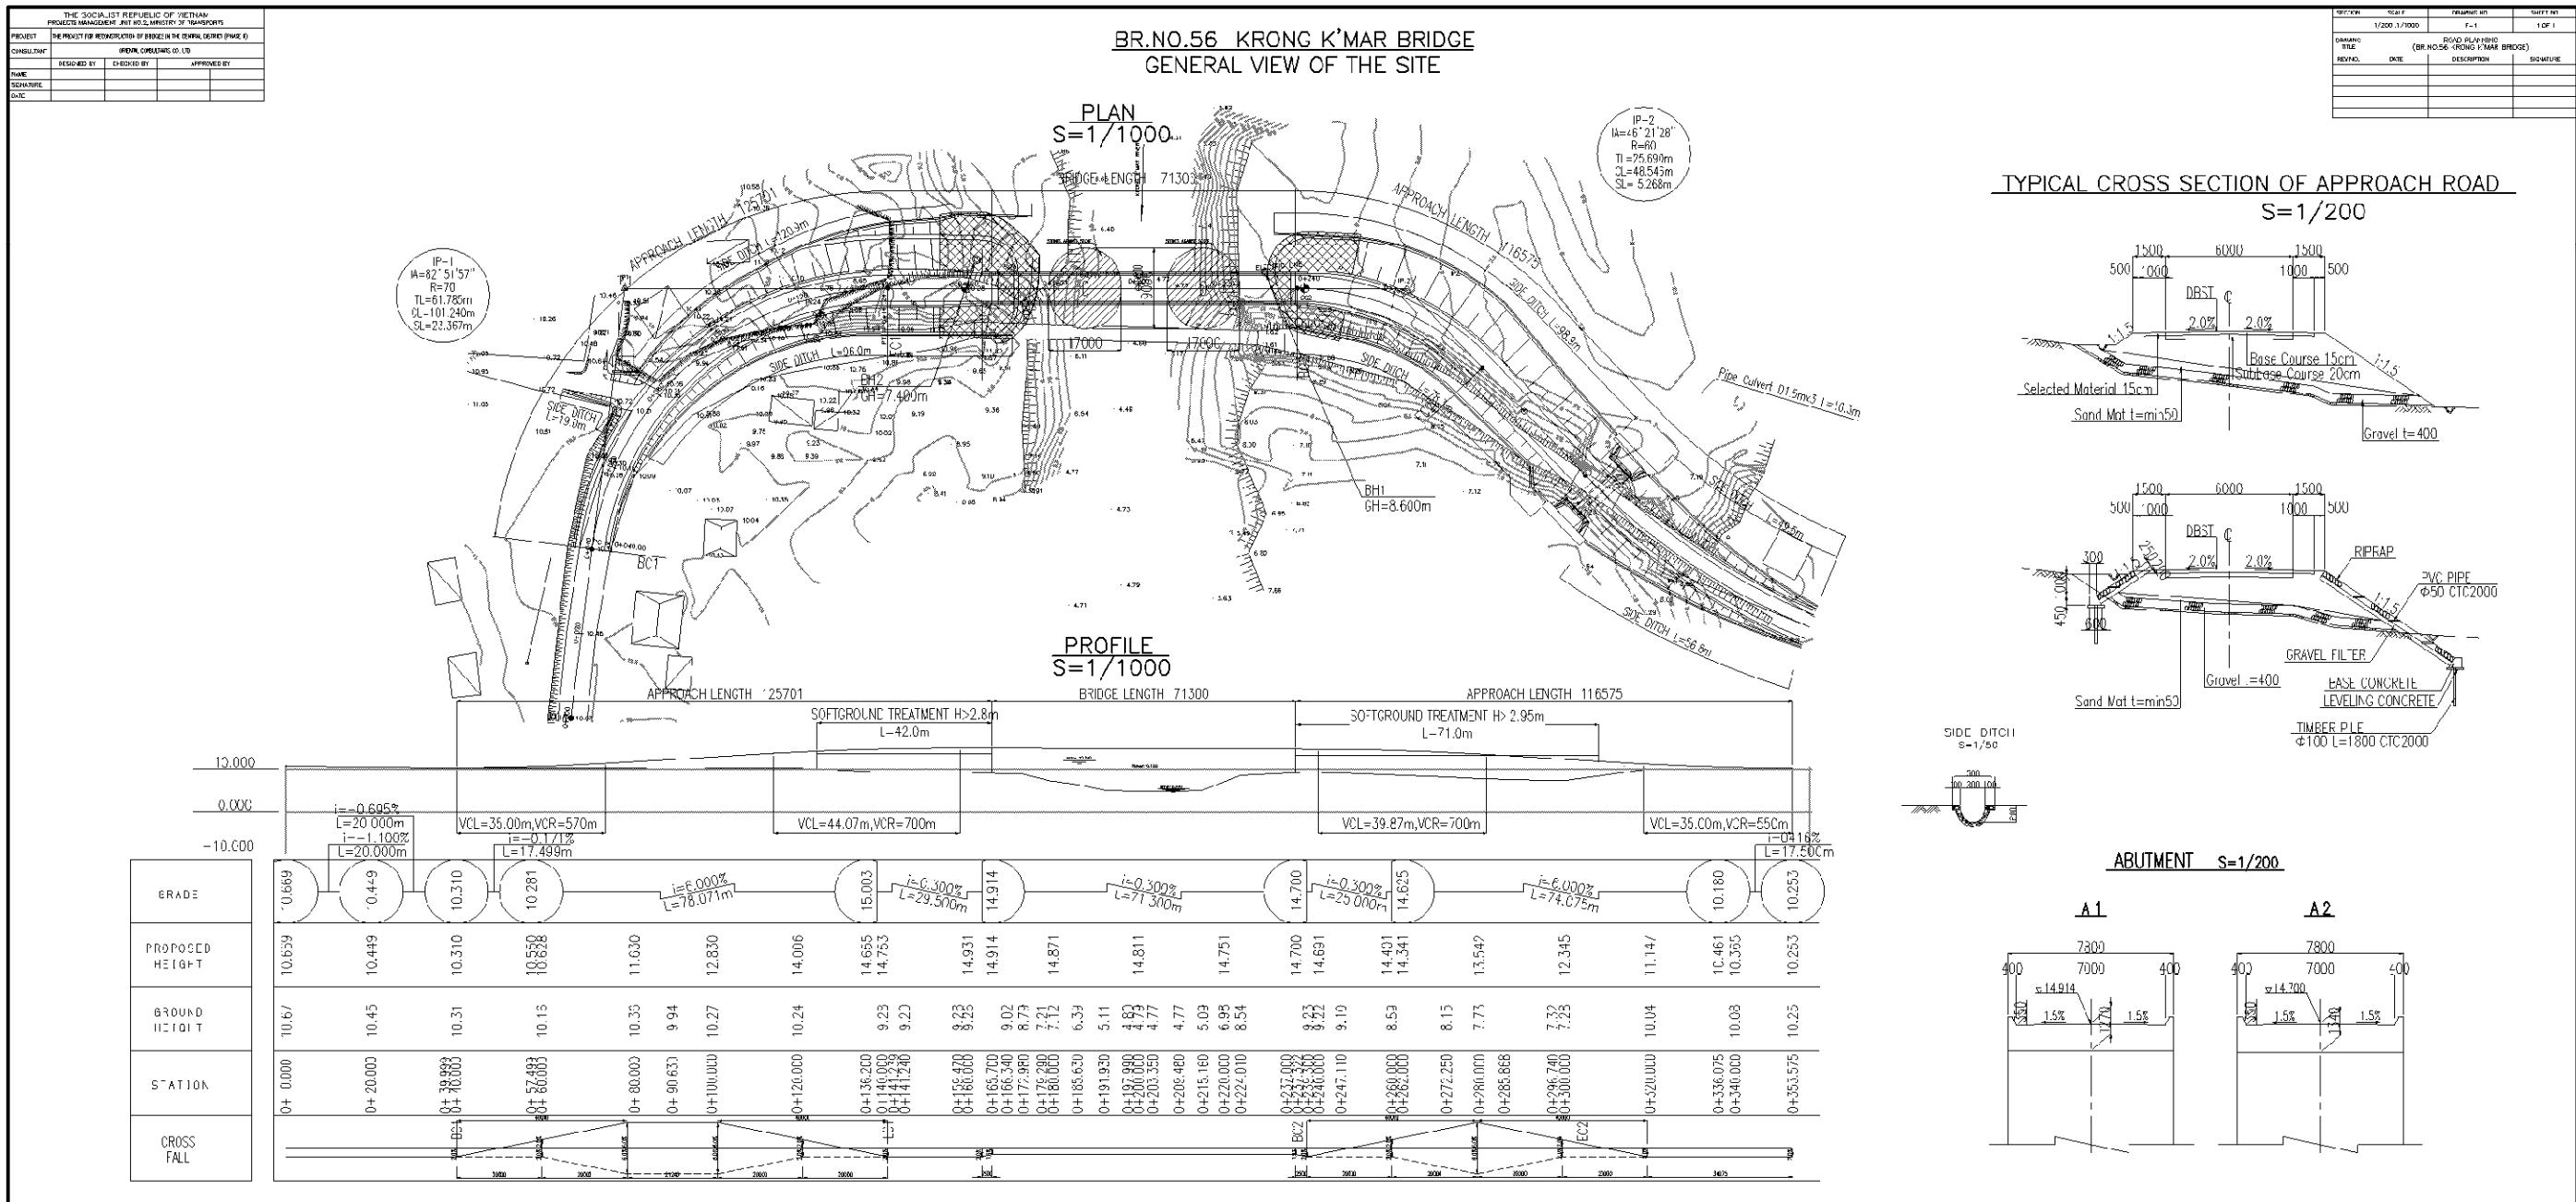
Krong K'mar Bridge (General View throughout Site)
